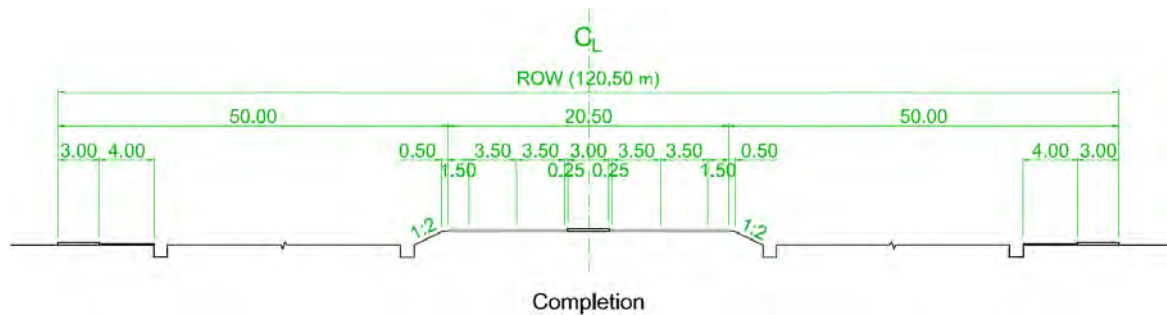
Typical Cross Section for Nacala Port Access Road (At Completion)
